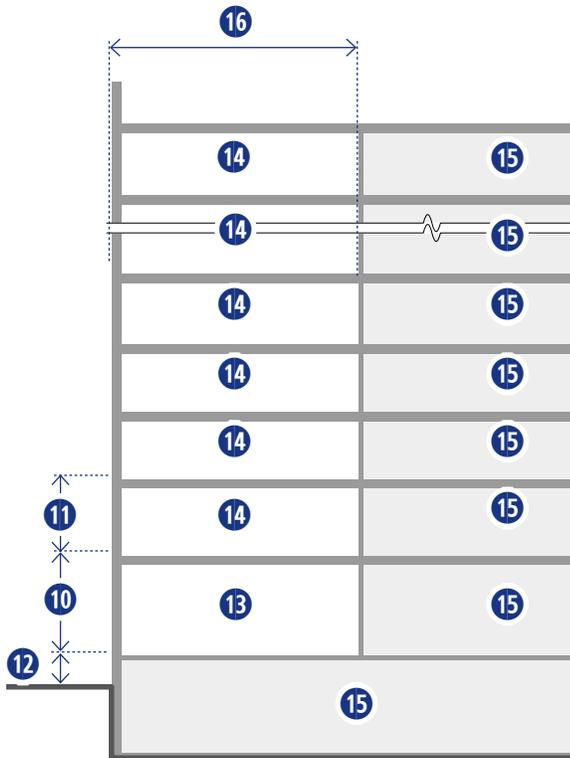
General Building: Floor-to-Floor Height & Use Requirements
